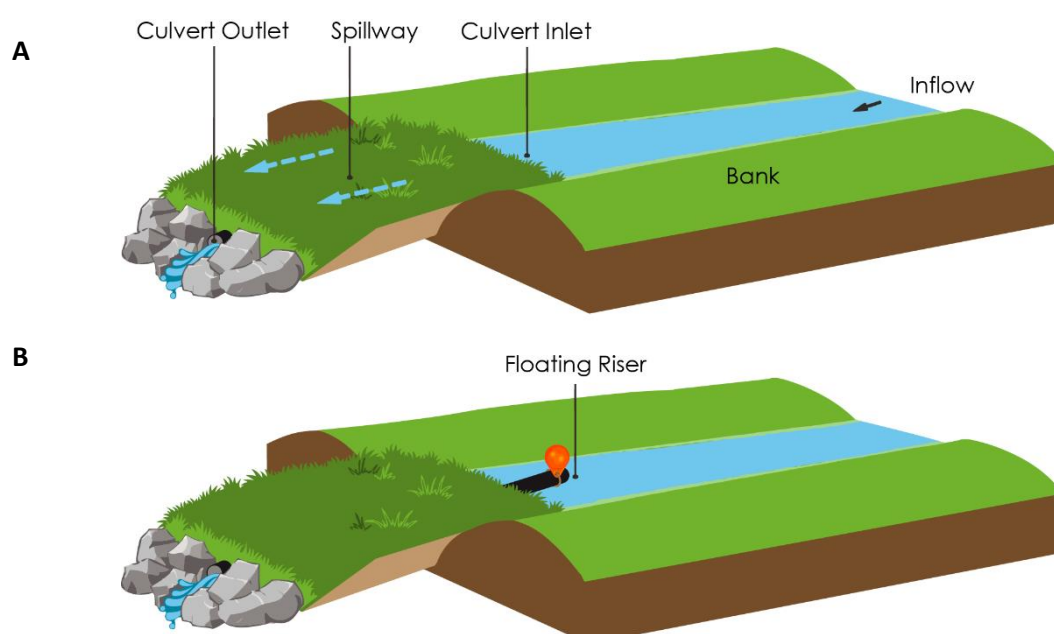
A) Low earth check dam with spillway; B) Low earth check dam with potential decanting riser pipe (adapted from Paterson et al., 2014). The culvert outlet will subsequently discharge back into the open ditch drain. (Note: these designs are illustrated to show the designs during a runoff event).
